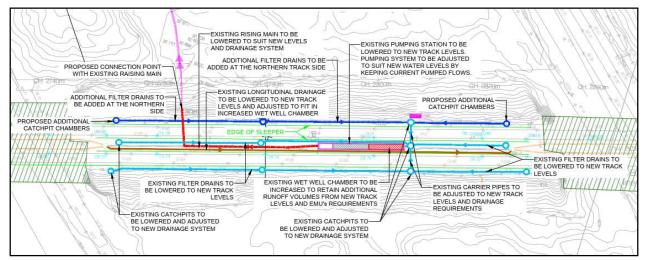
Proposed Drainage Upgrade Between OBO8 and OBO9
